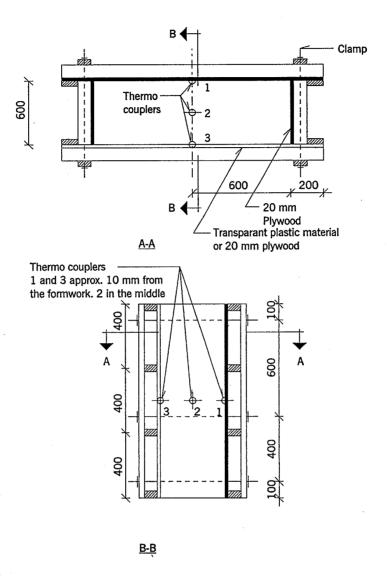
Basic pre-testing of workmanship. Standard test specimen. Formwork and placing of thermo couplers.
